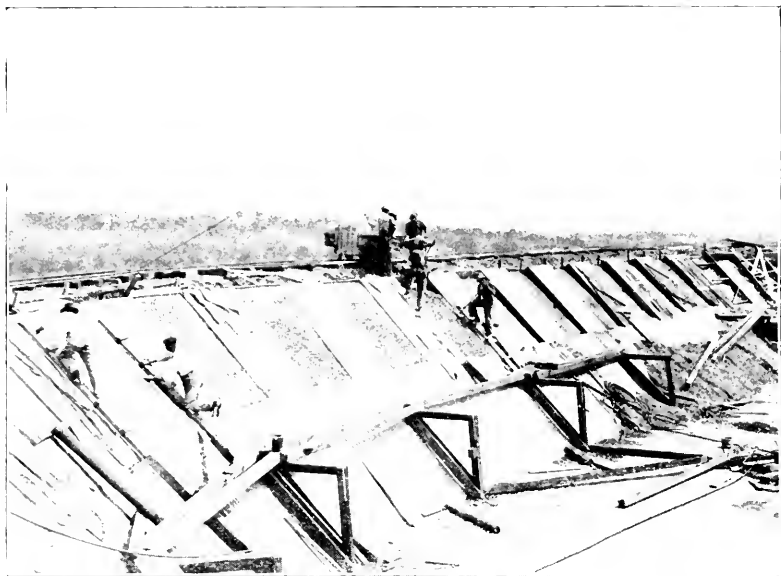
LAYING AND SURFACING UPPER LAYER OF CONCRETE.
